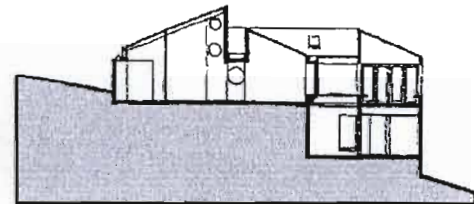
BDG – House Ramkisson (1969). Plans.
